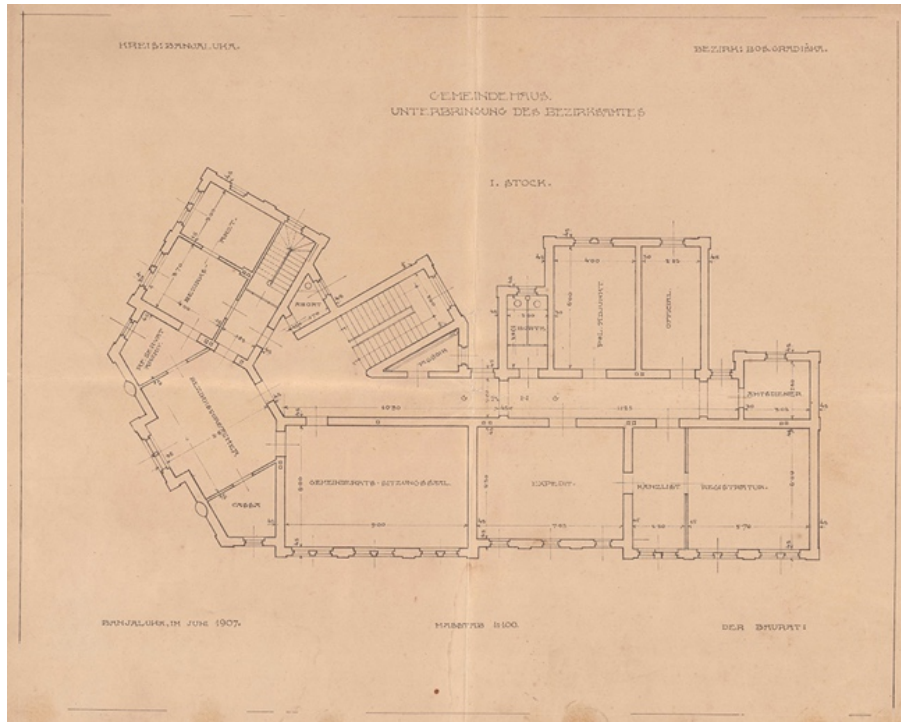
Gradiška, floor plan of the former municipal building, first floor, dated 1907.
